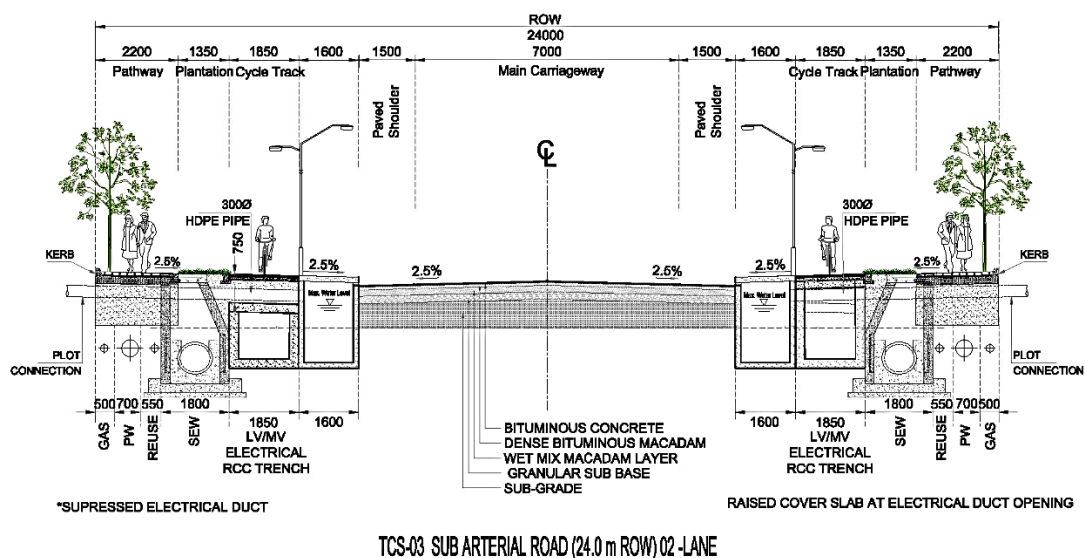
PROPOSED ROAD SECTION FOR KOPPARTHY INDUSTRIAL AREA -24M ROW
